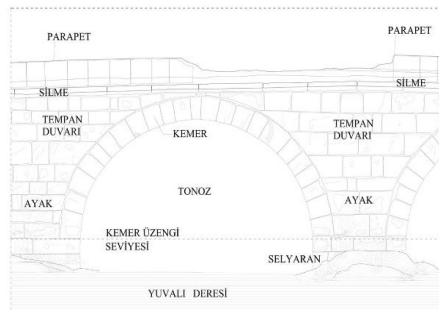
The arch details of Büyükkarıştıran Bridge (Ayberkin, 2018).
